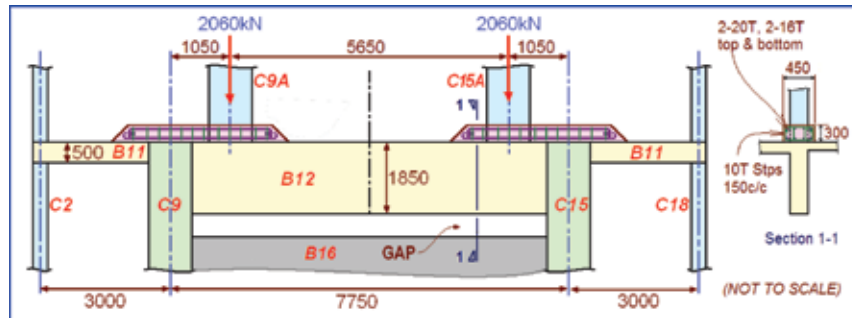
Author's Modified Proposal for Additional R.C. section. ('n'T = 'n' mm dia.)
